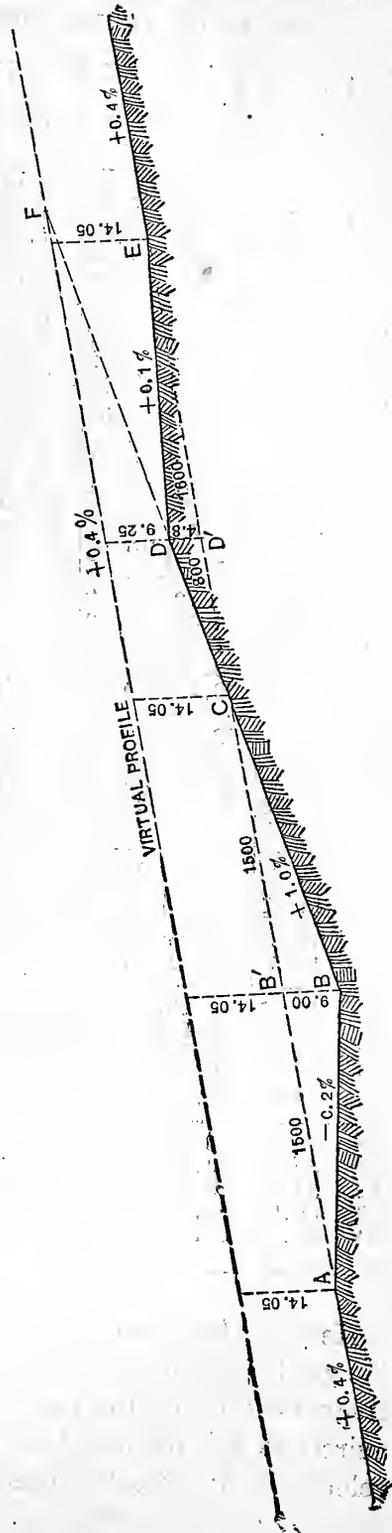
TYPICAL PROFILE OF ROAD SECTION.
